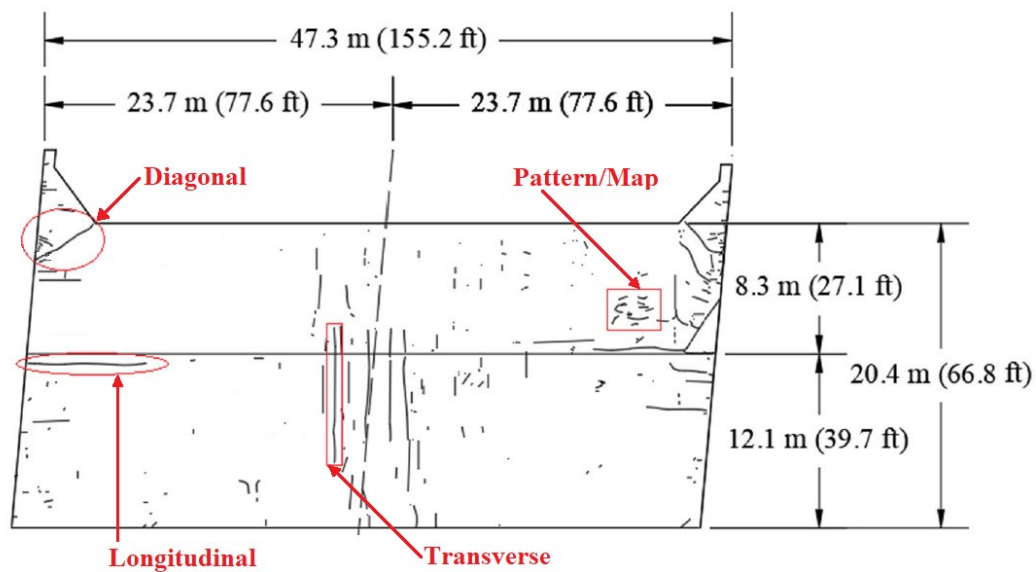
Transverse, Longitudinal, Diagonal, and Pattern/Map Cracking (Darwin et al. 2016)-*modified
